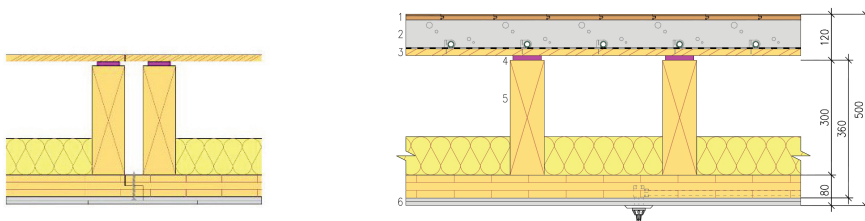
Extracts of floor configurations with CLT-glulam floor elements from RunkoPES 2.0 (Finnish Wood Research, 2013) – Legend - 1: parquet flooring; 2: cement screed; 3: wood based panel; 4: Sylomer or equivalent; 5: structural floor glulam-CLT; 6: gypsum boards, (dimensions in mm).
